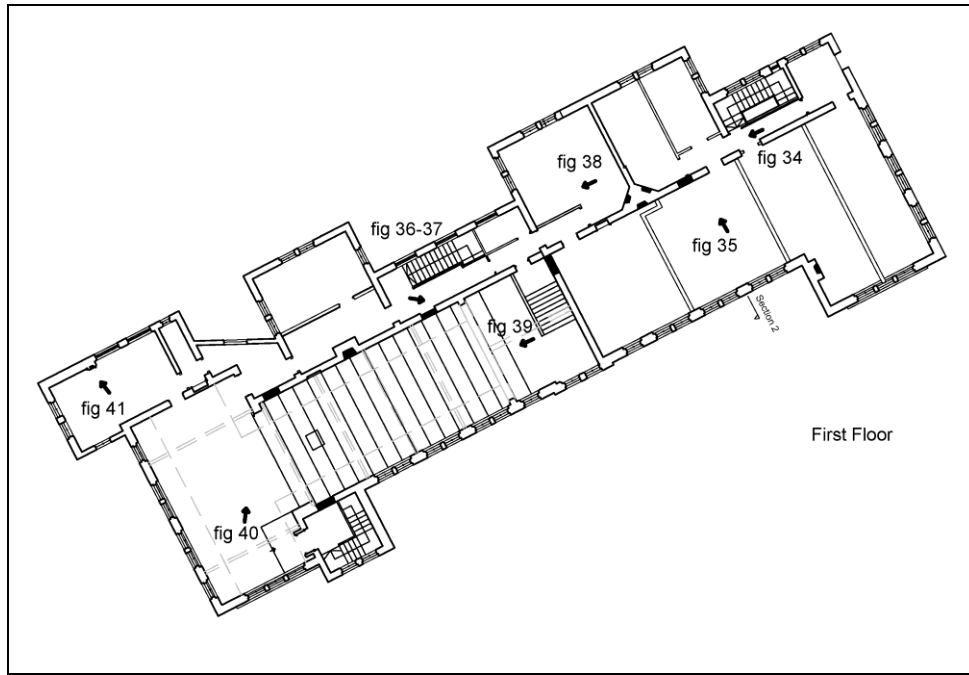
Location plan of first floor photographs included below as figures 34-41.
